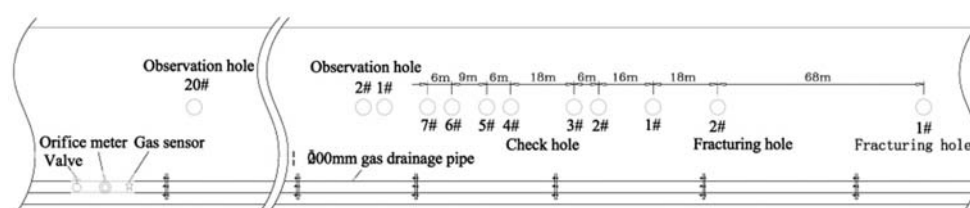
Layout of the hydraulic fracturing holes in the haulage tunnel
